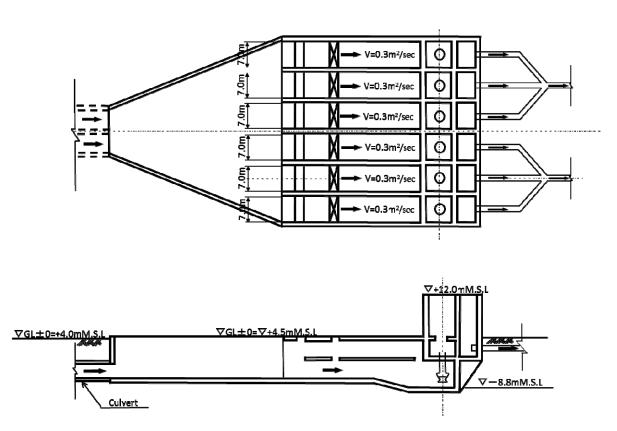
Outline (Plan and Section) for Pump Pit
